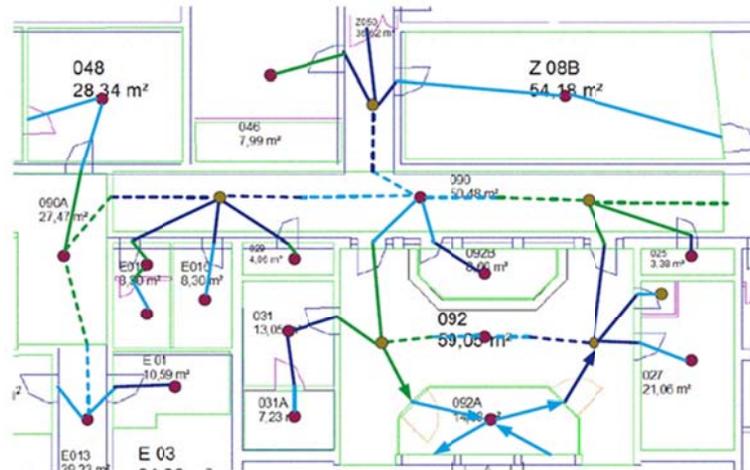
Floor plan with overlaid network graph (Lorenz et. al. 2006).
